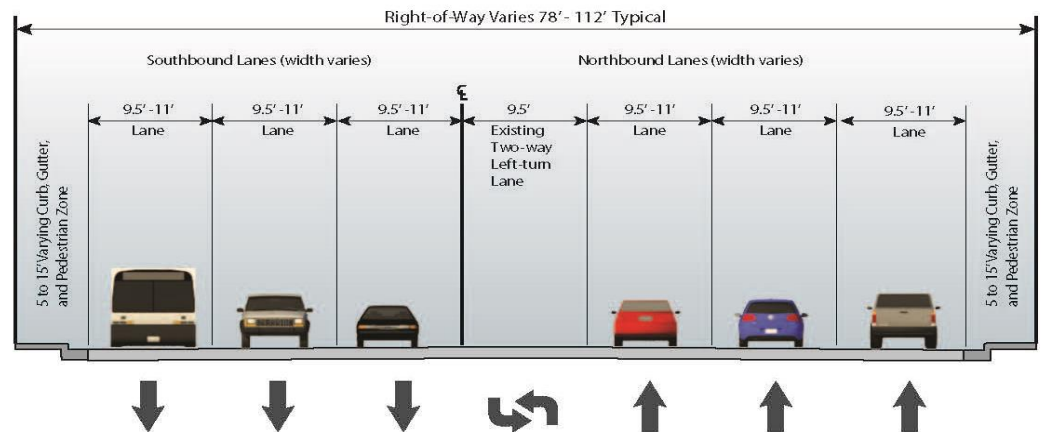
Cross-Section of the No-Action Alternative between West 10th Avenue and West Howard Place
